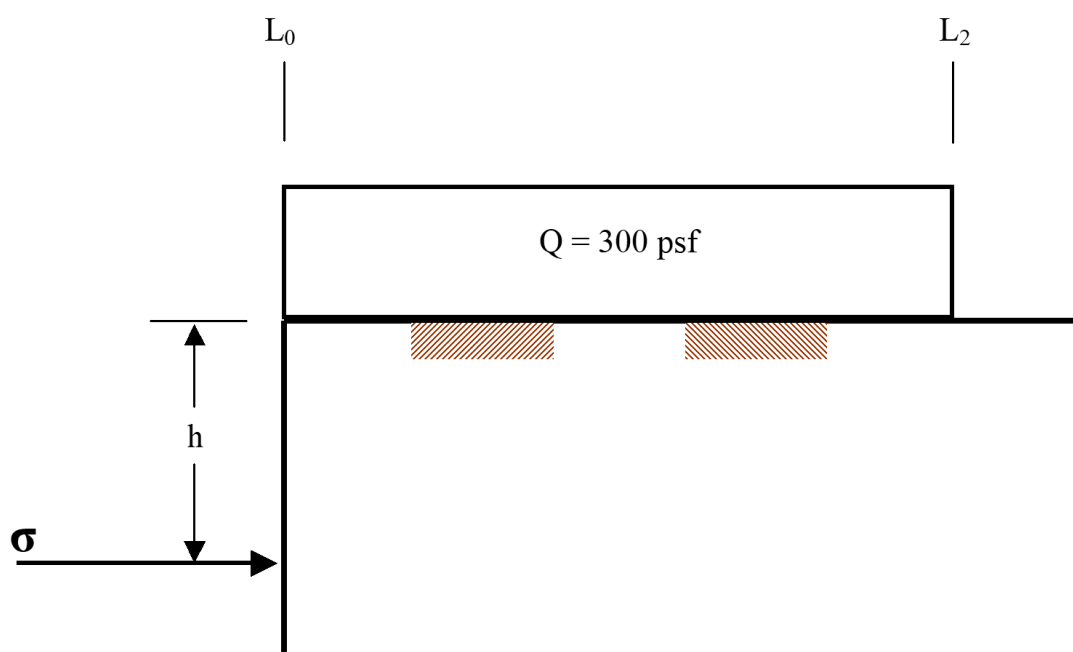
Typical 300 psf Vertical Surcharge Starting at Face of Excavation
